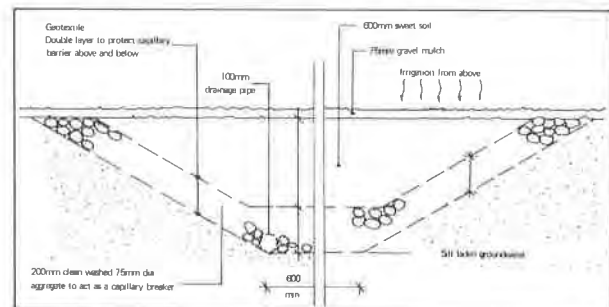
Typical Section, geotextile protected capillary break (after the Landscape Design Group).
